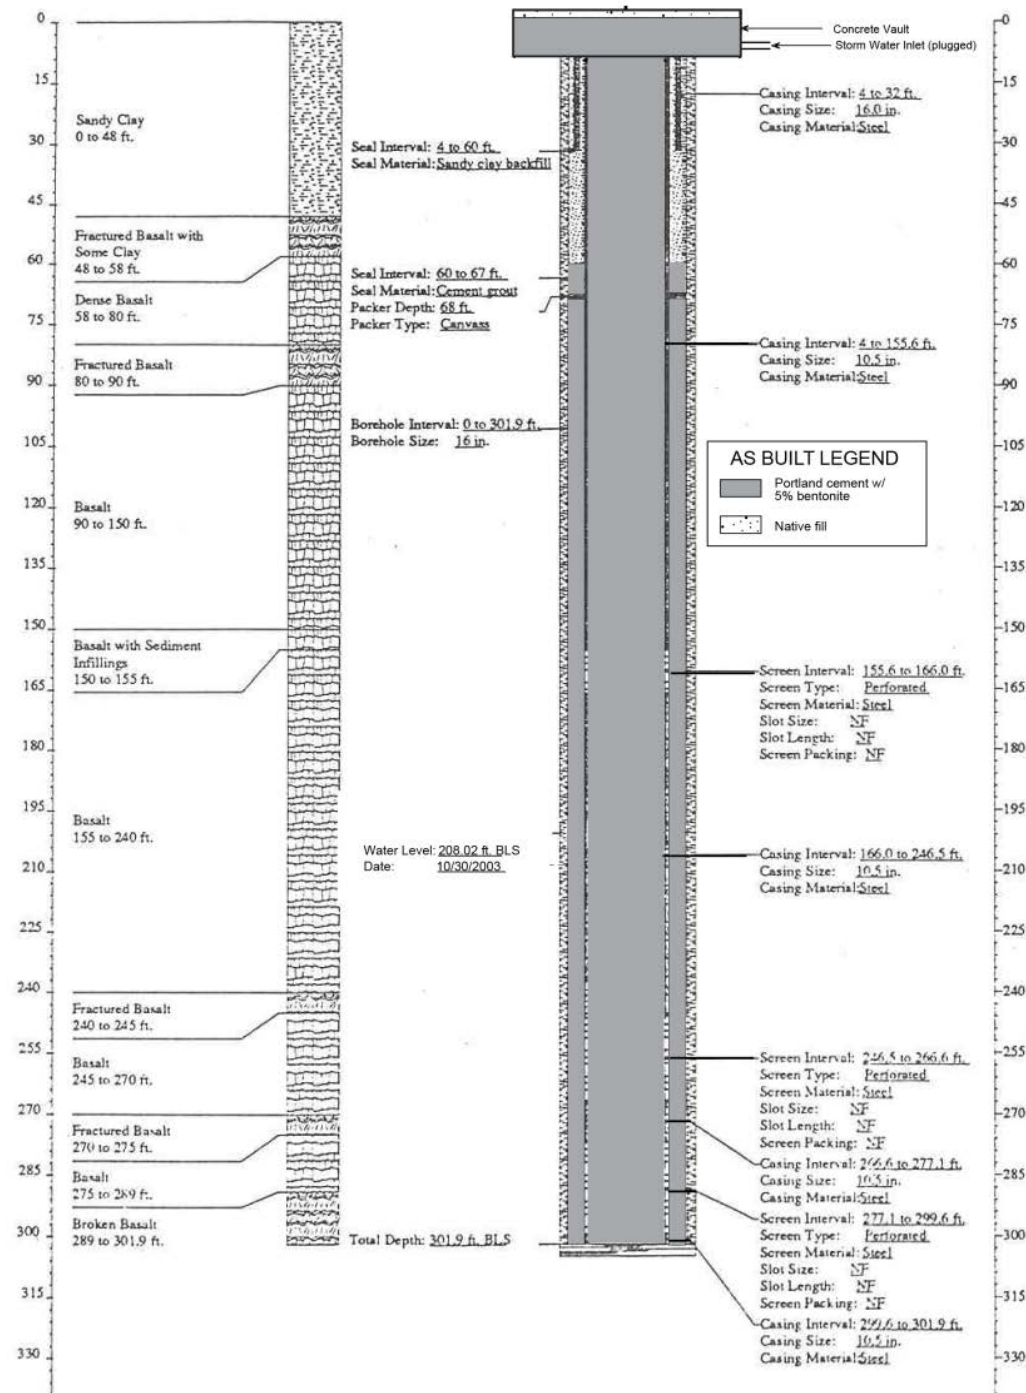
Construction diagram showing decommissioned storm water injection well TAN DRAINAGE DISP. 03
